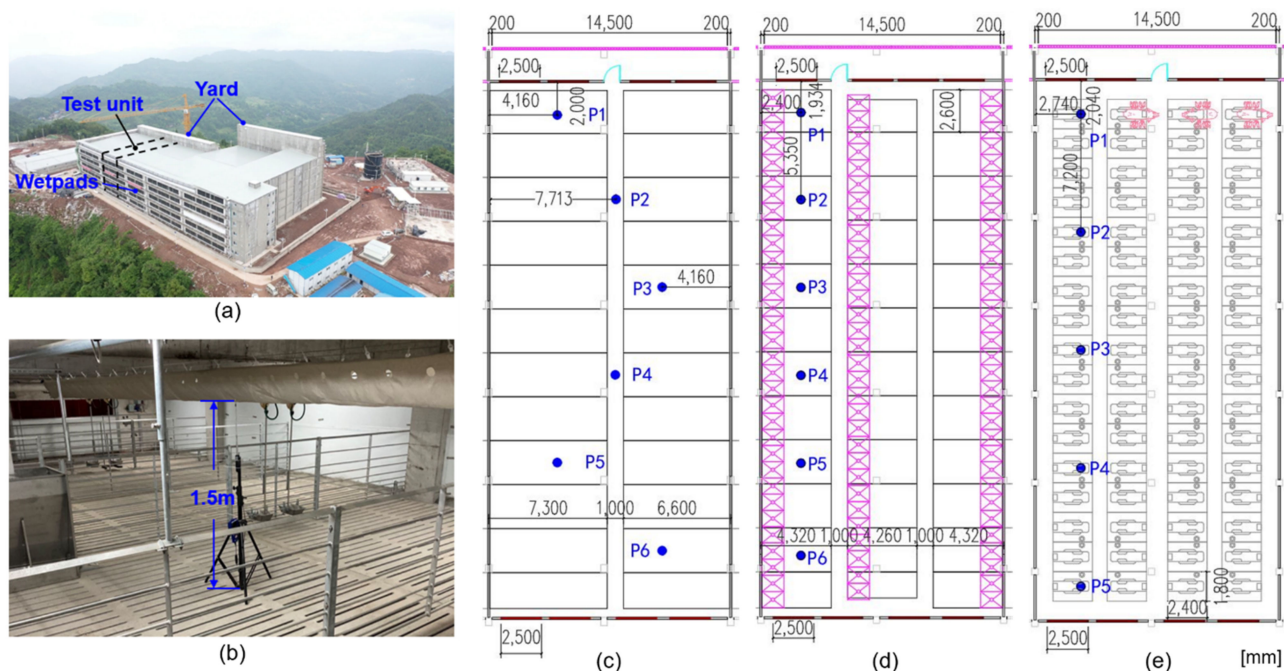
Photos of the (a) tested MFPB and (b) measurement sensor. The layout of the measurement locations at (c) 1st floor (finishing room), (d) 2nd and 3rd floor (nursery room), and (e) 4th and 5th floor (farrowing room) in the raising part in tested MFPB (marked as the blue dot). The shaft part was omitted in (c–e).
